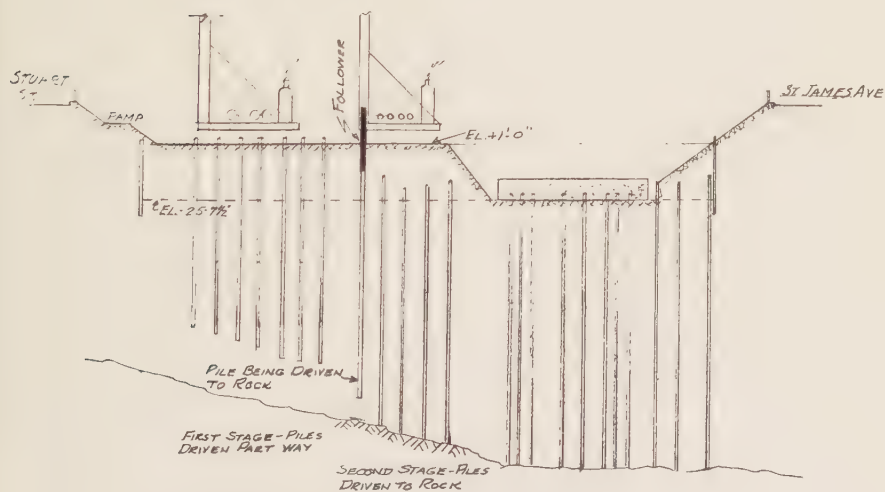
CROSS SECTION OF BUILDING SITE ILLUSTRATING STAGES OF PILE DRIVING OPERATIONS.
